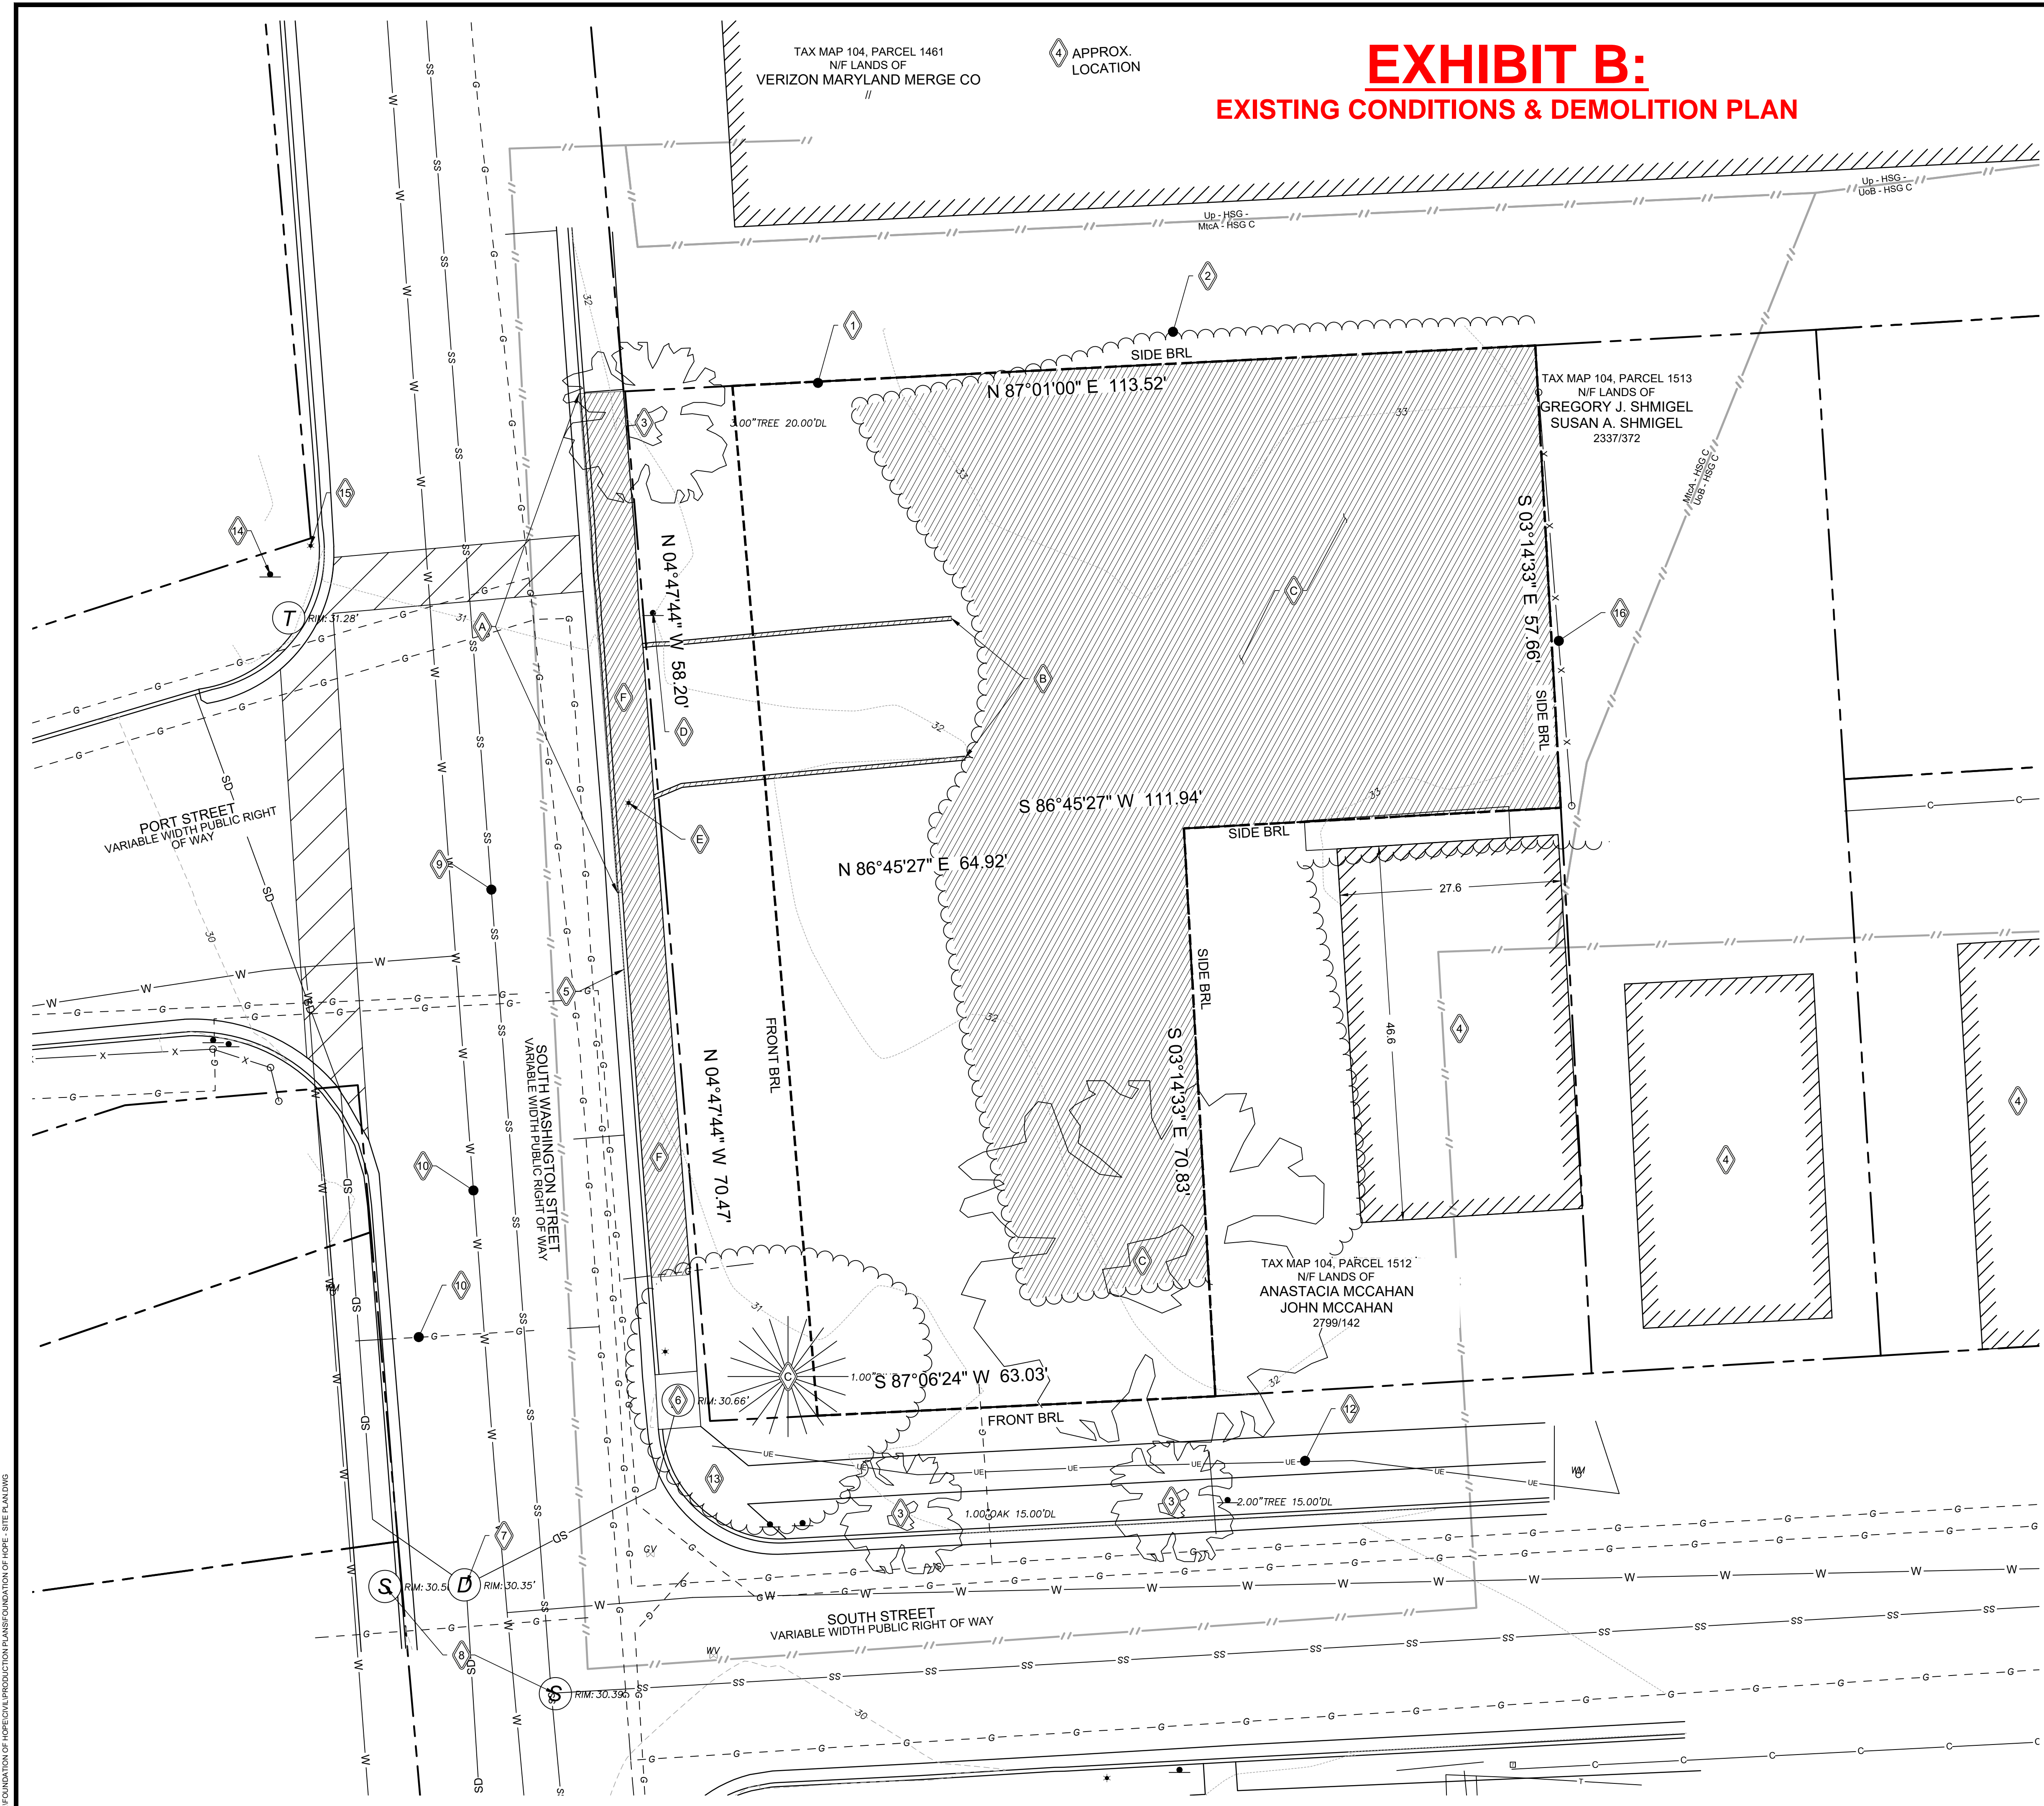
EXHIBIT B: EXISTING CONDITIONS & DEMOLITION PLAN
